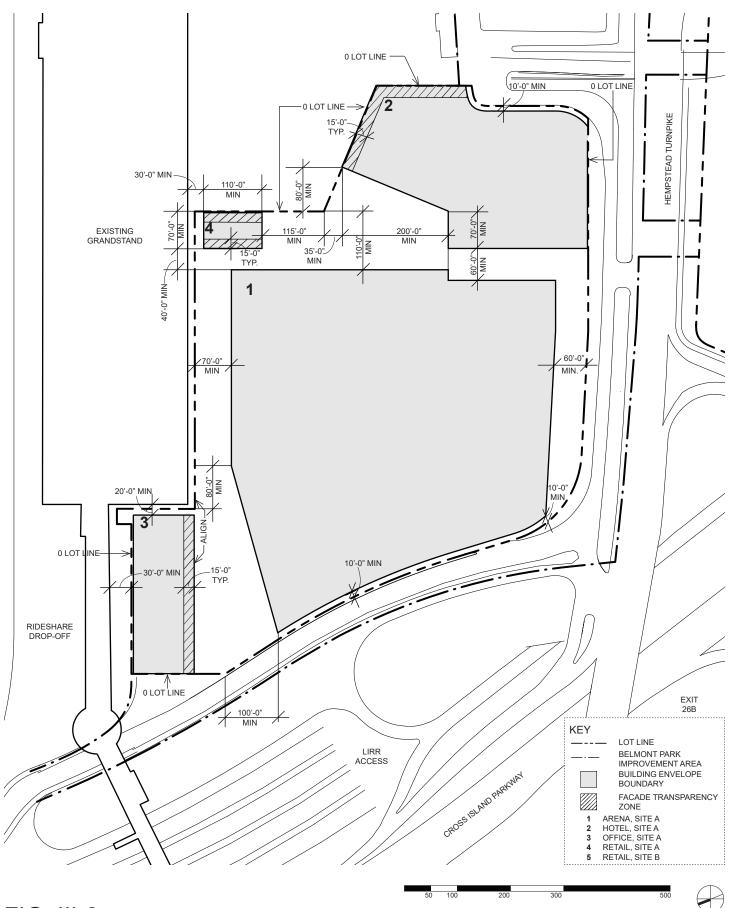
BUILDING ENVELOPE BOUNDARIES - SITE A
